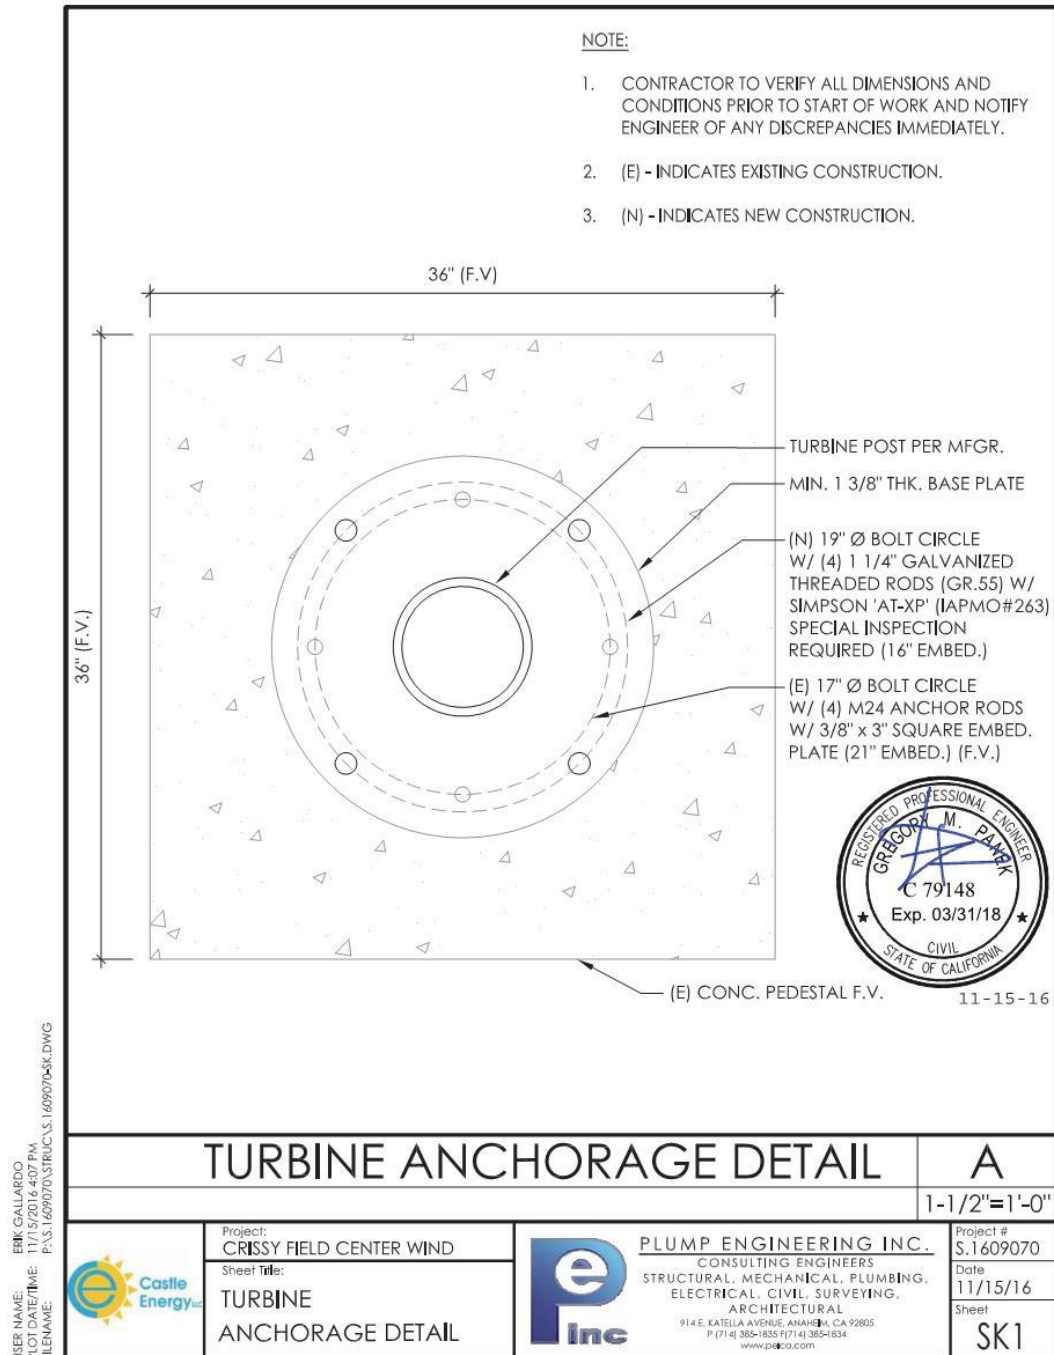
The existing Windspire foundations required additional anchor bolts to receive the new UGE towers and turbine assemblies (see report 1).
